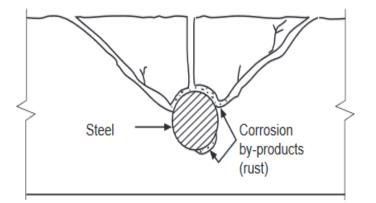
Concrete cracks due to reinforcement corrosion (PCA, 2002)
